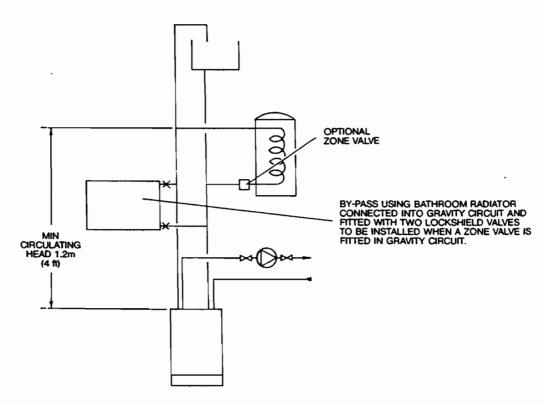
OPEN VENTED GRAVITY DOMESTIC HOT WATER AND PUMPED CENTRAL HEATING SYSTEM
